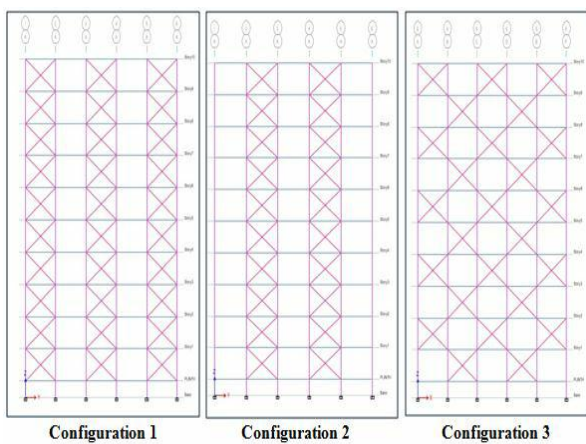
G+10 RC framed building with X-bracings for different configurations.
